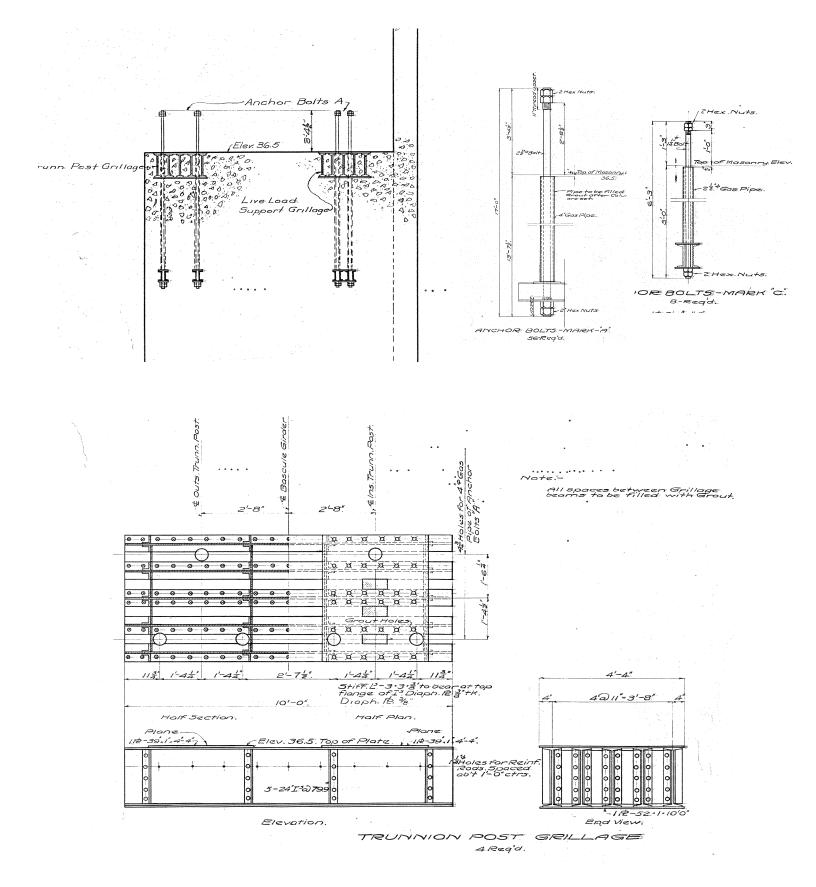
Burnside Bridge Piers 2 & 3, Anchorage of the Trunnion Frame to the Bascule Piers
